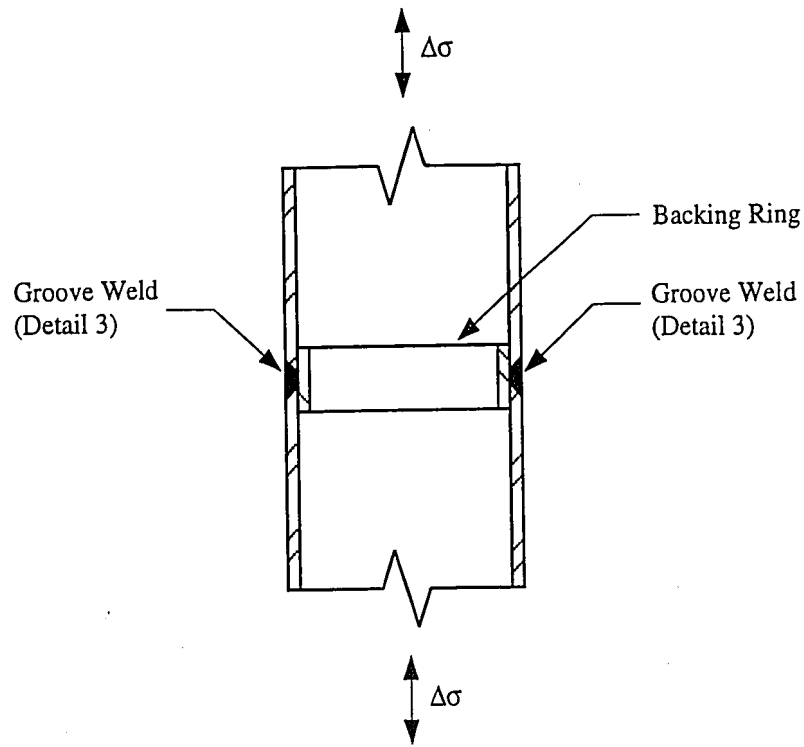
Groove-Welded Butt-Splice.
